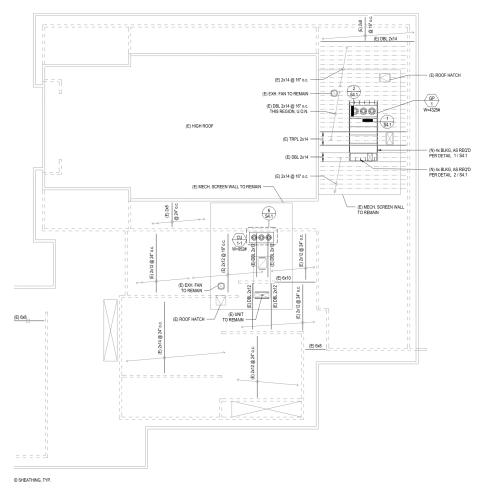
BUILDING 1: 2017 HVAC Upgrade Roof Framing Plan
